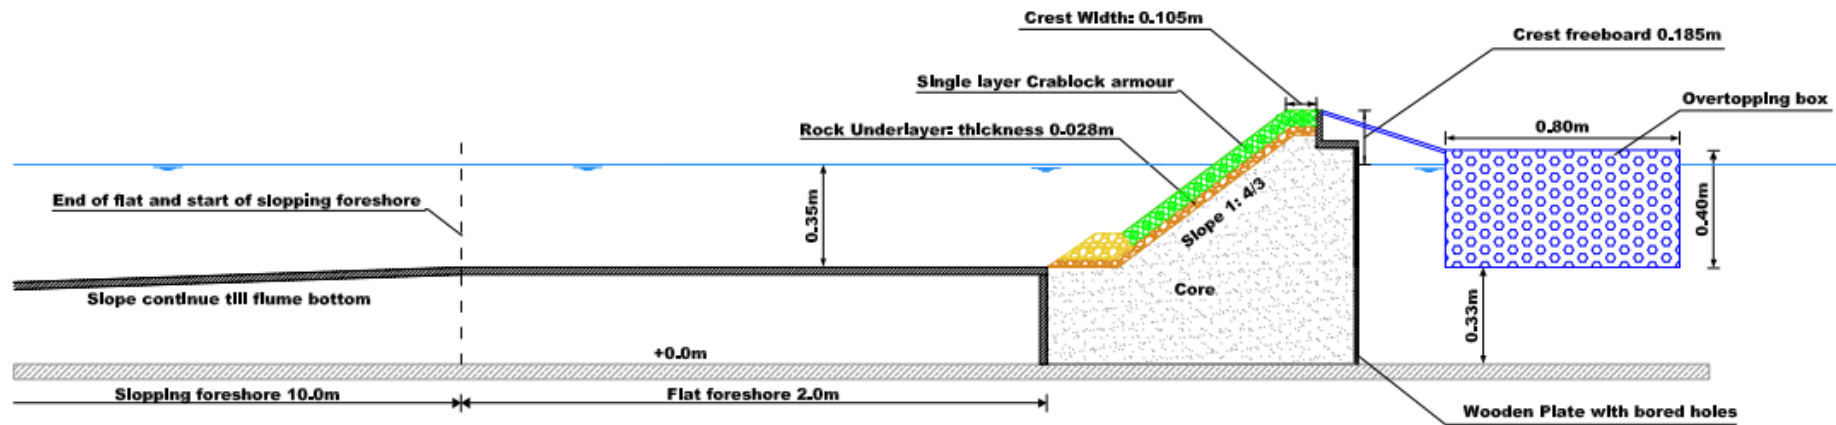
Cross-section of model breakwater with crablock armour slope ($R_c = 1.6 \times$ Design wave height); tests 9-10
